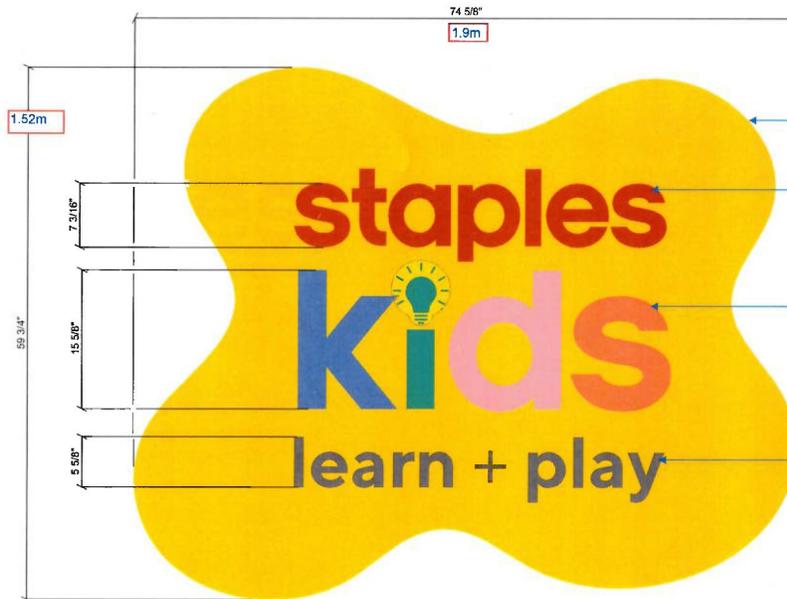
Detail of Proposed Sign (from plans prepared by Priority Permits Ltd.)
